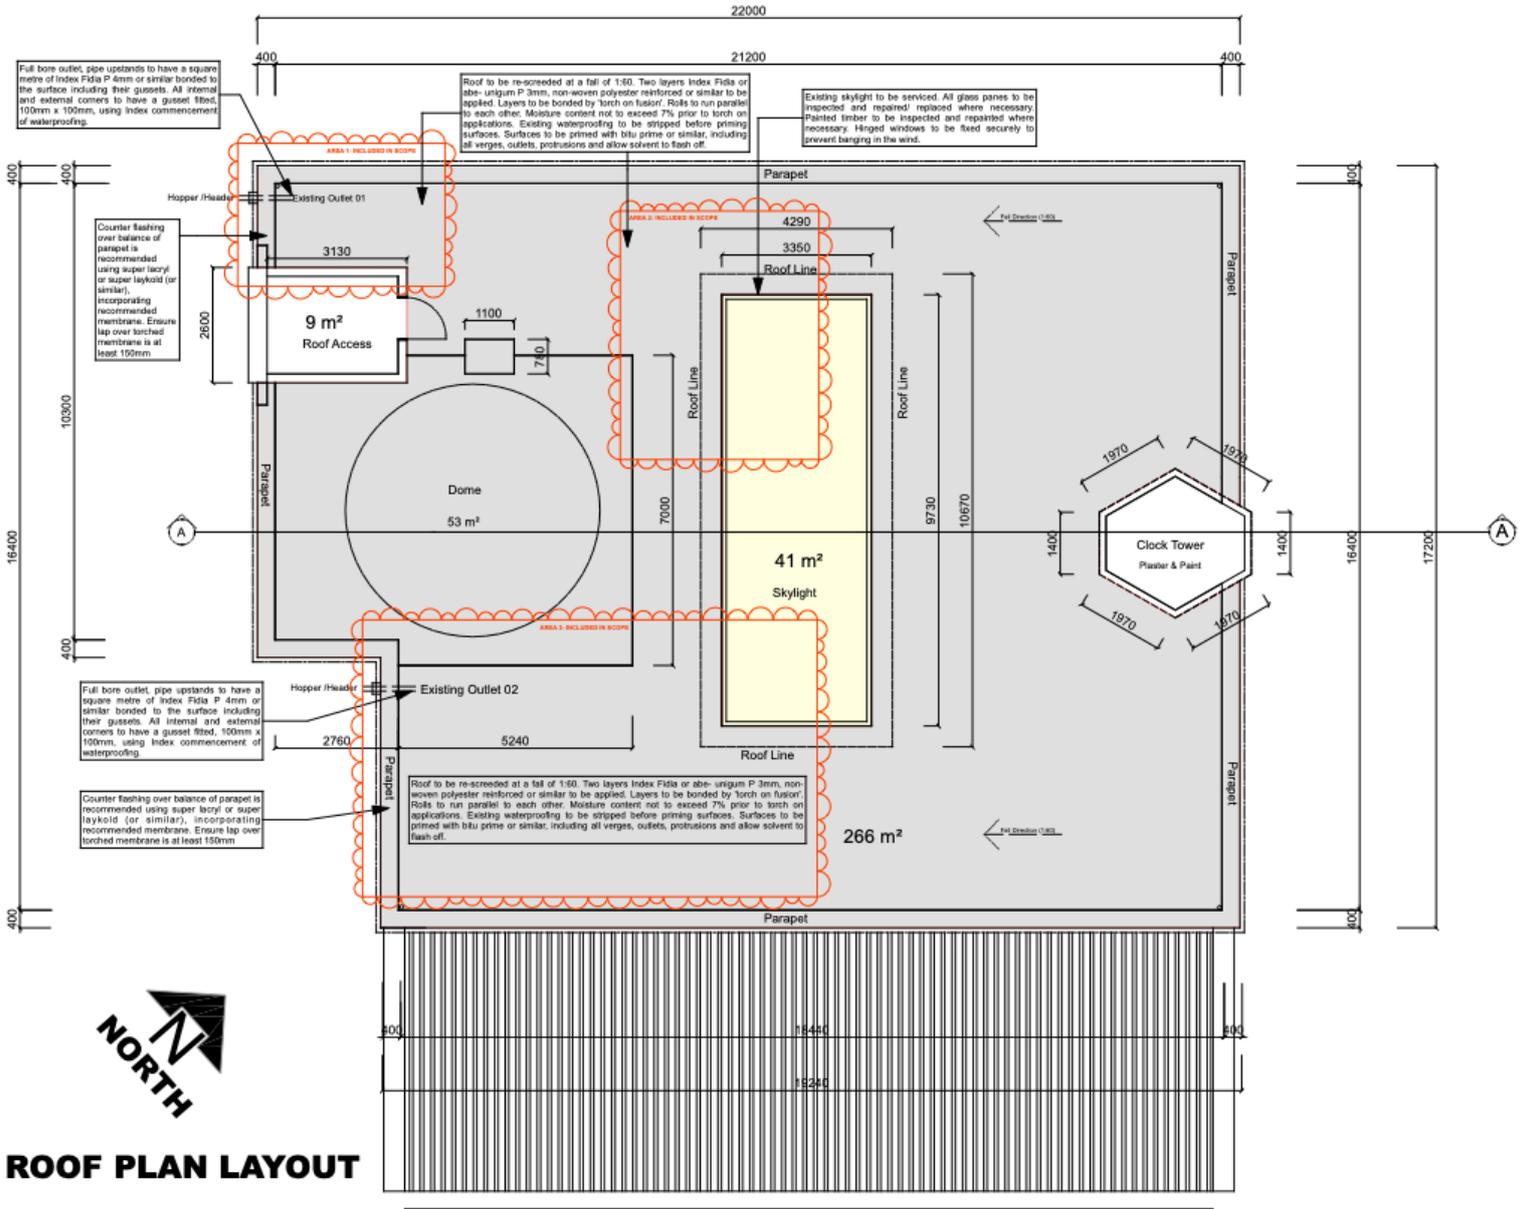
Roof Plan Layout proposing maintenance and repairs in specific areas (see Annexure A).
